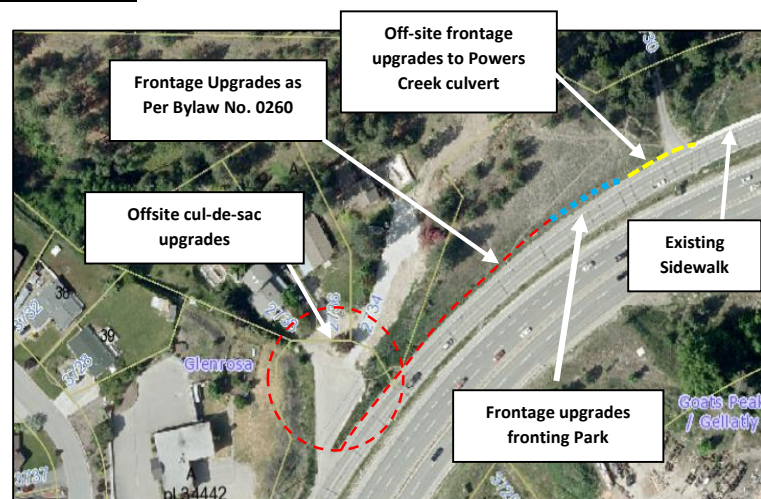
Cul-de-Sac and Proposed Sidewalk Extension Lower Glenrosa
